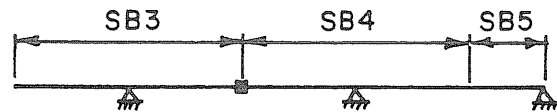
Elevation and Designation of the Various Segments of the Kishwaukee River Bridge
